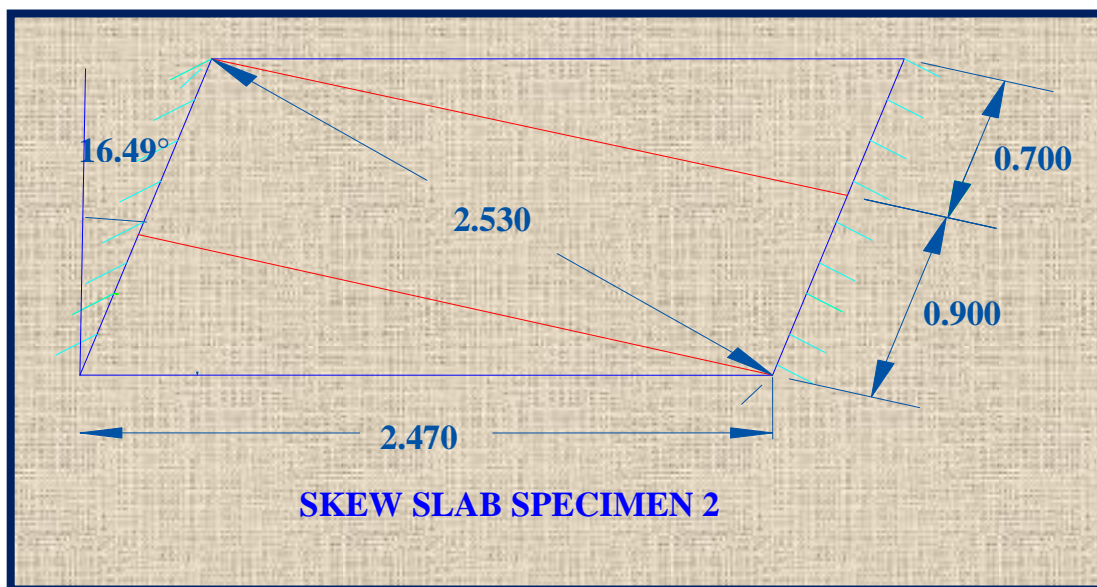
Skew slab with short diagonal greater than span ($L > l$) [(24)]
